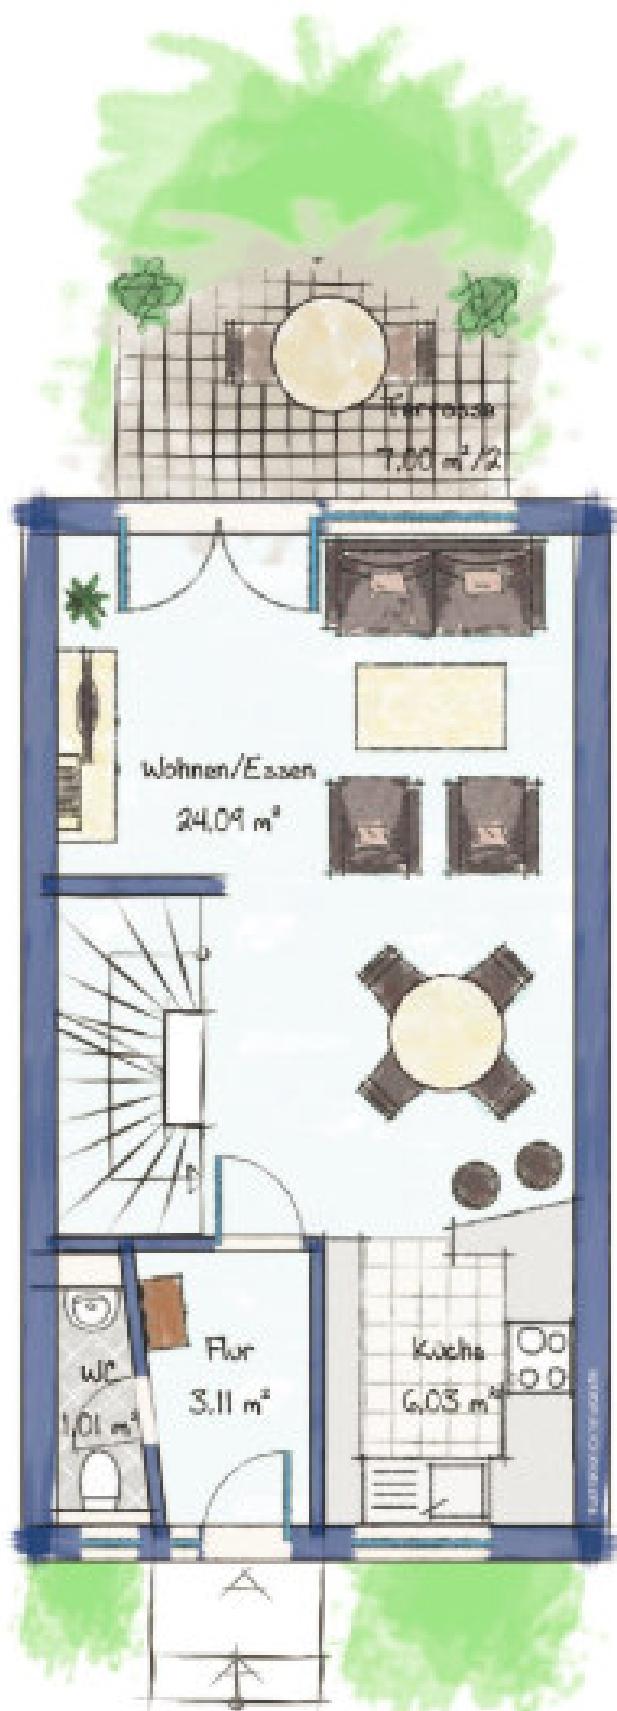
Terraced house, building location: Freiburg, earthquake zone 1, 2 [10]
